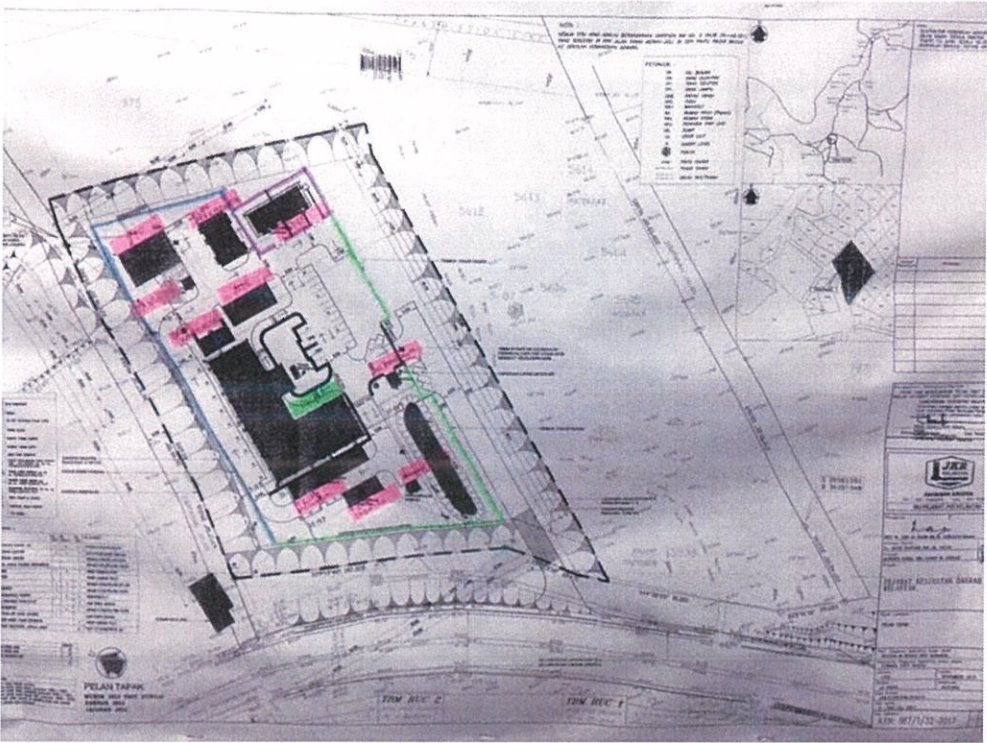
Site plan of Pejabat Kesihatan Daerah (PKD) Jeli, Kelantan
